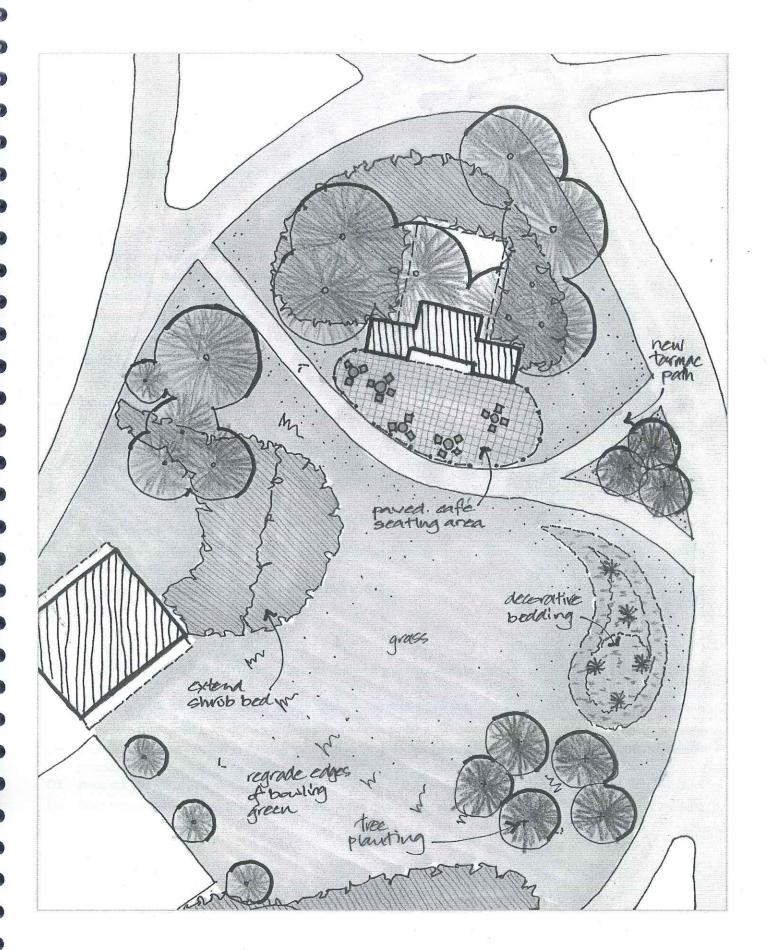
Sketch Design for Wandsworth Park Cafe with external seating area and additional decorative bedding, shrub and tree planting, on the site of the bowling green and bowling pavilion.
